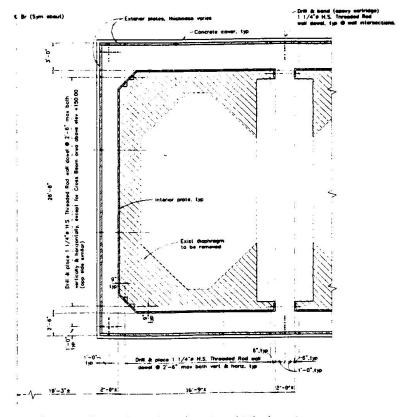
Part Typical Wall Section Showing Steel Plating Arrangement
